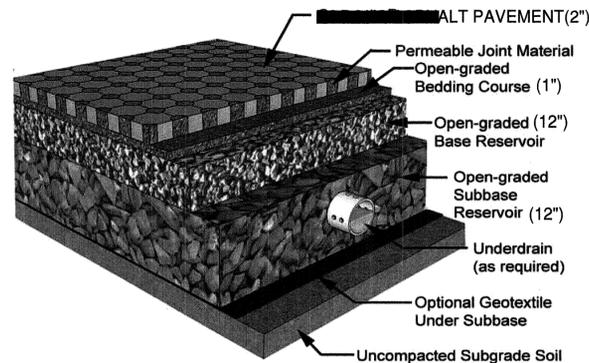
Typical Detail (Source: Smith, 2009)
